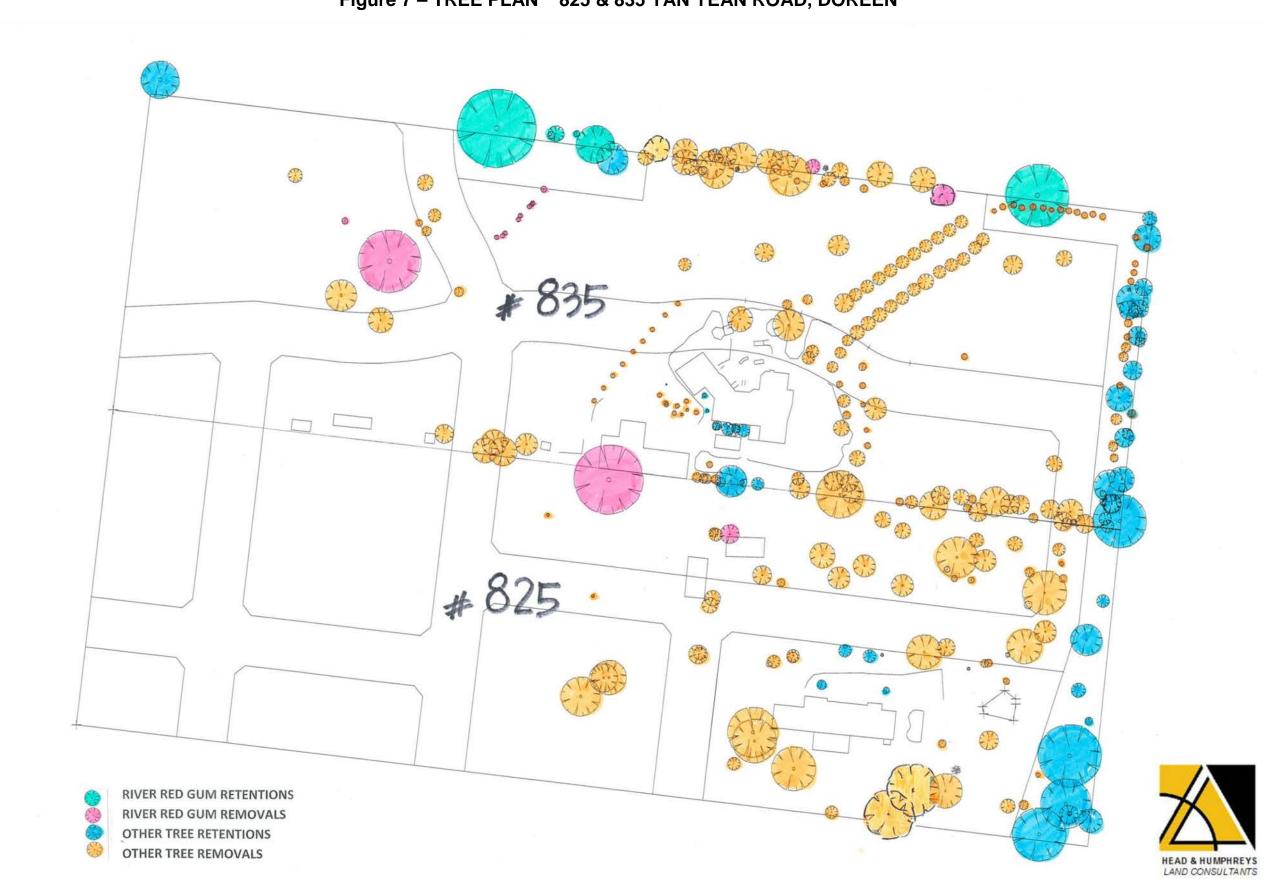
TREE PLAN 825 & 835 YAN YEAN ROAD, DOREEN
